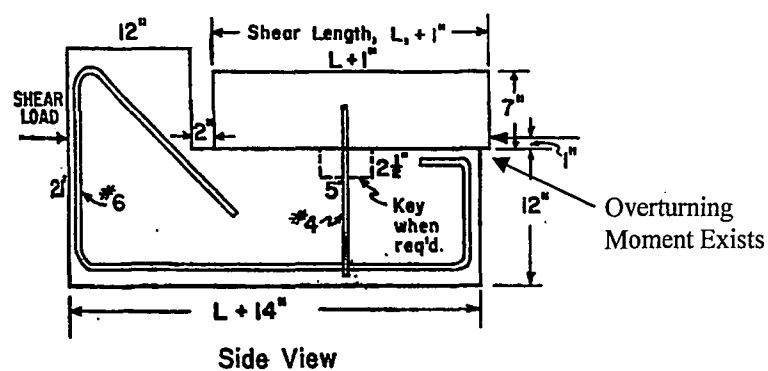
Side View of Hanson's Push-Off Test Specimen
